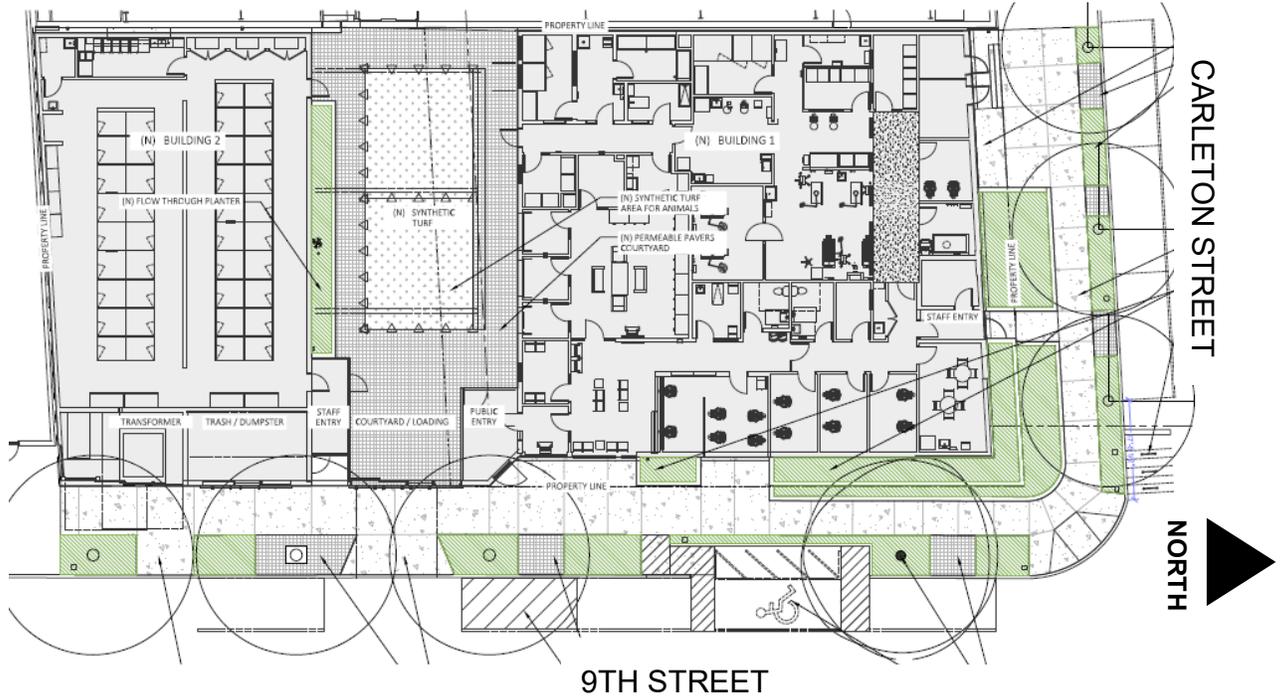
Site Plan – Approved in 2015, UP2013-0055
